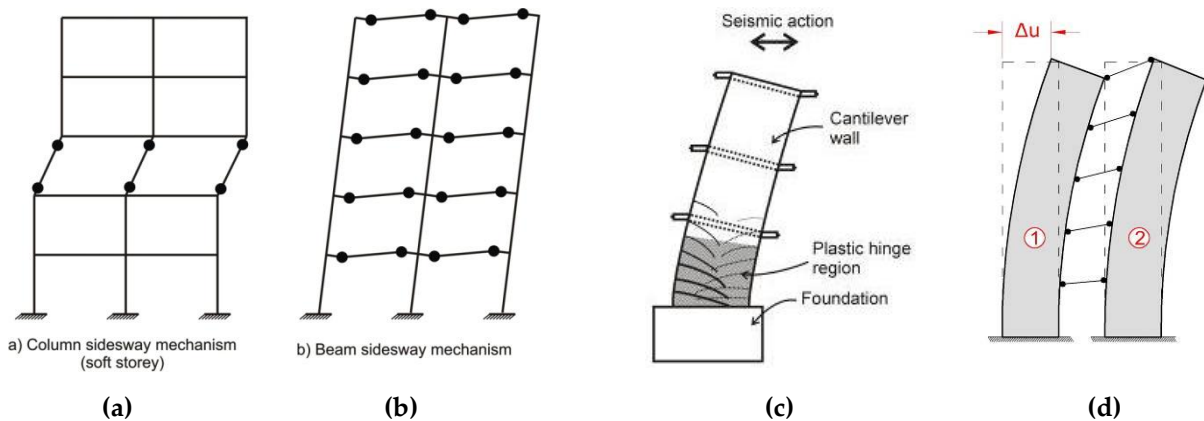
Plastic hinge locations in multi-storey buildings: (a) Frame with column side-sway mechanism. (b) Frame with beam side-sway mechanism. (c) Plastic hinge at base of multi storey shear wall. (d) Plastic hinges in beams of coupled shear wall.
